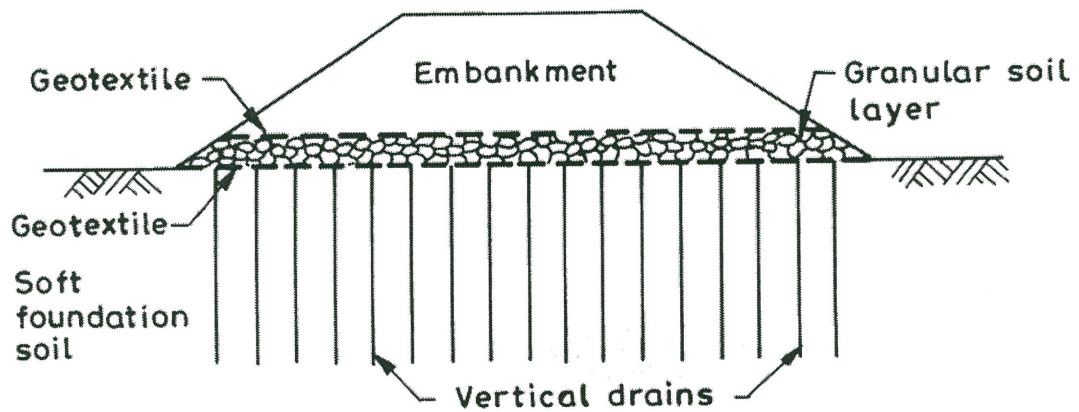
(a)(ii): Embankment Over Weak Foundation Soil with Vertical Drains and Basal Drainage Layer
